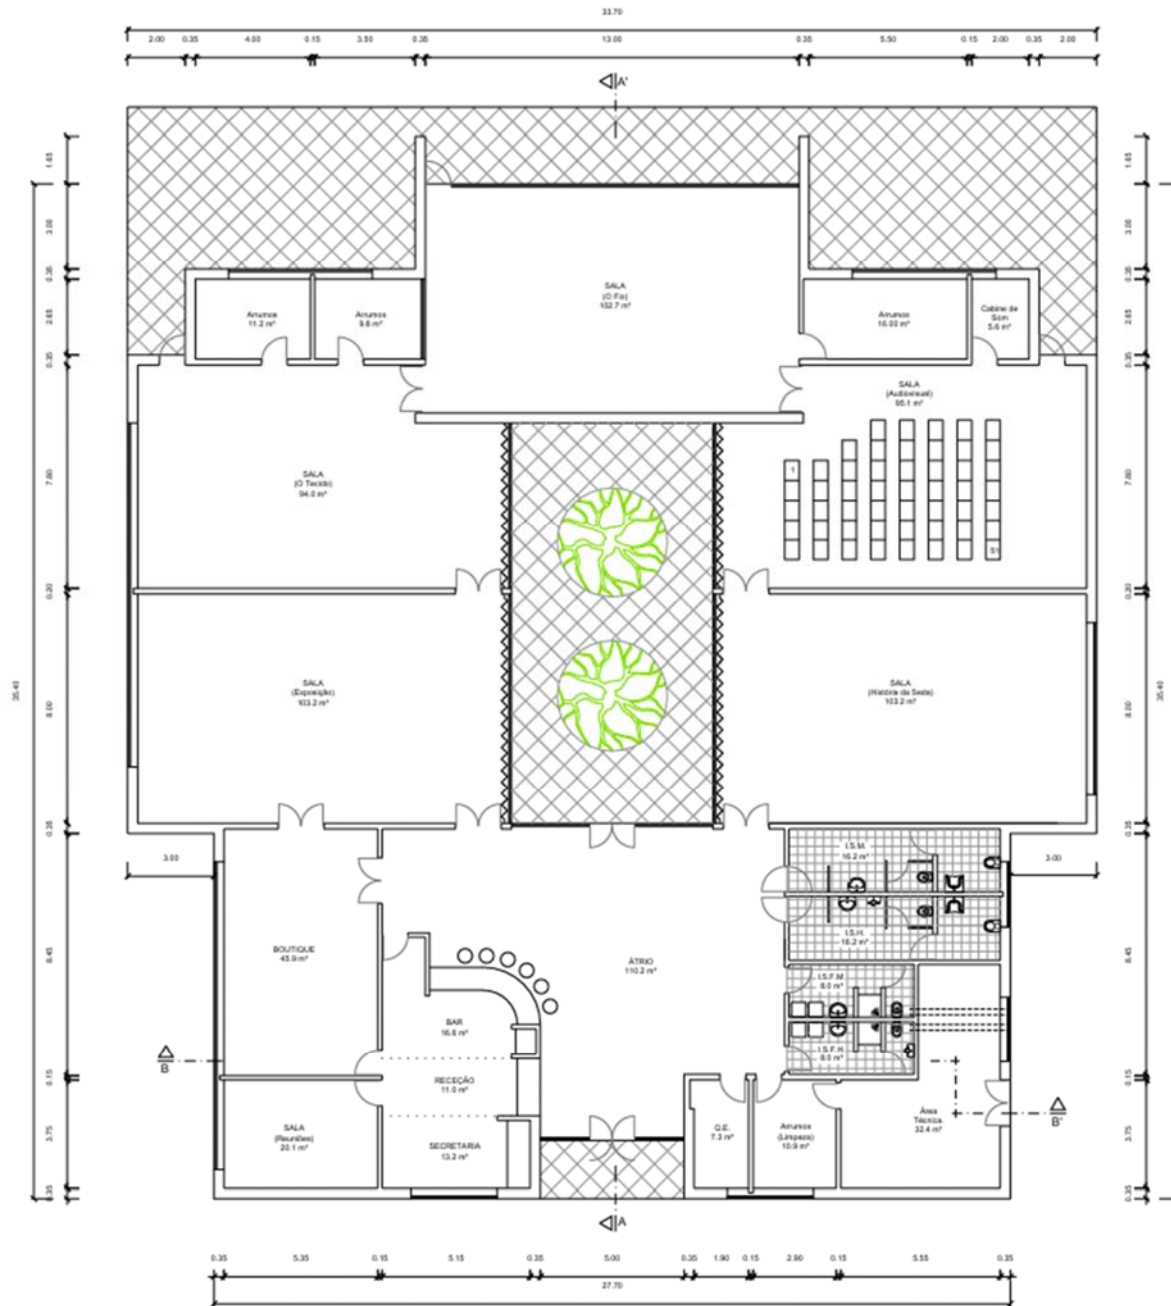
Ground Floor Architectural Plan of the Silk Museum
